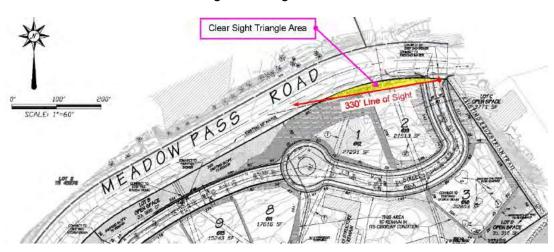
Line of Sight Looking West on Meadow Pass Road
